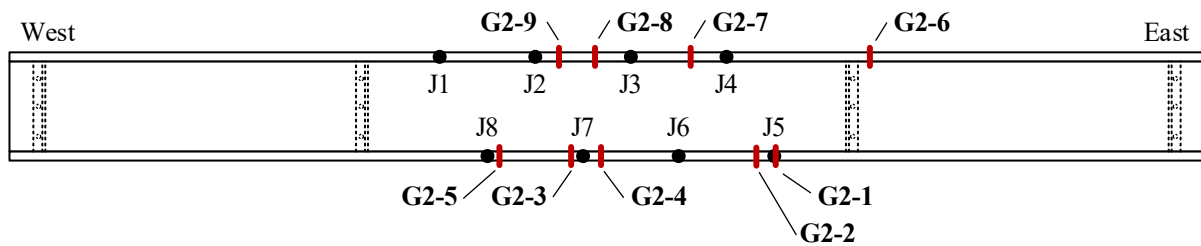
Illustration. Instrumentation layout for Girder 2 - Flange 1 (looking north).
